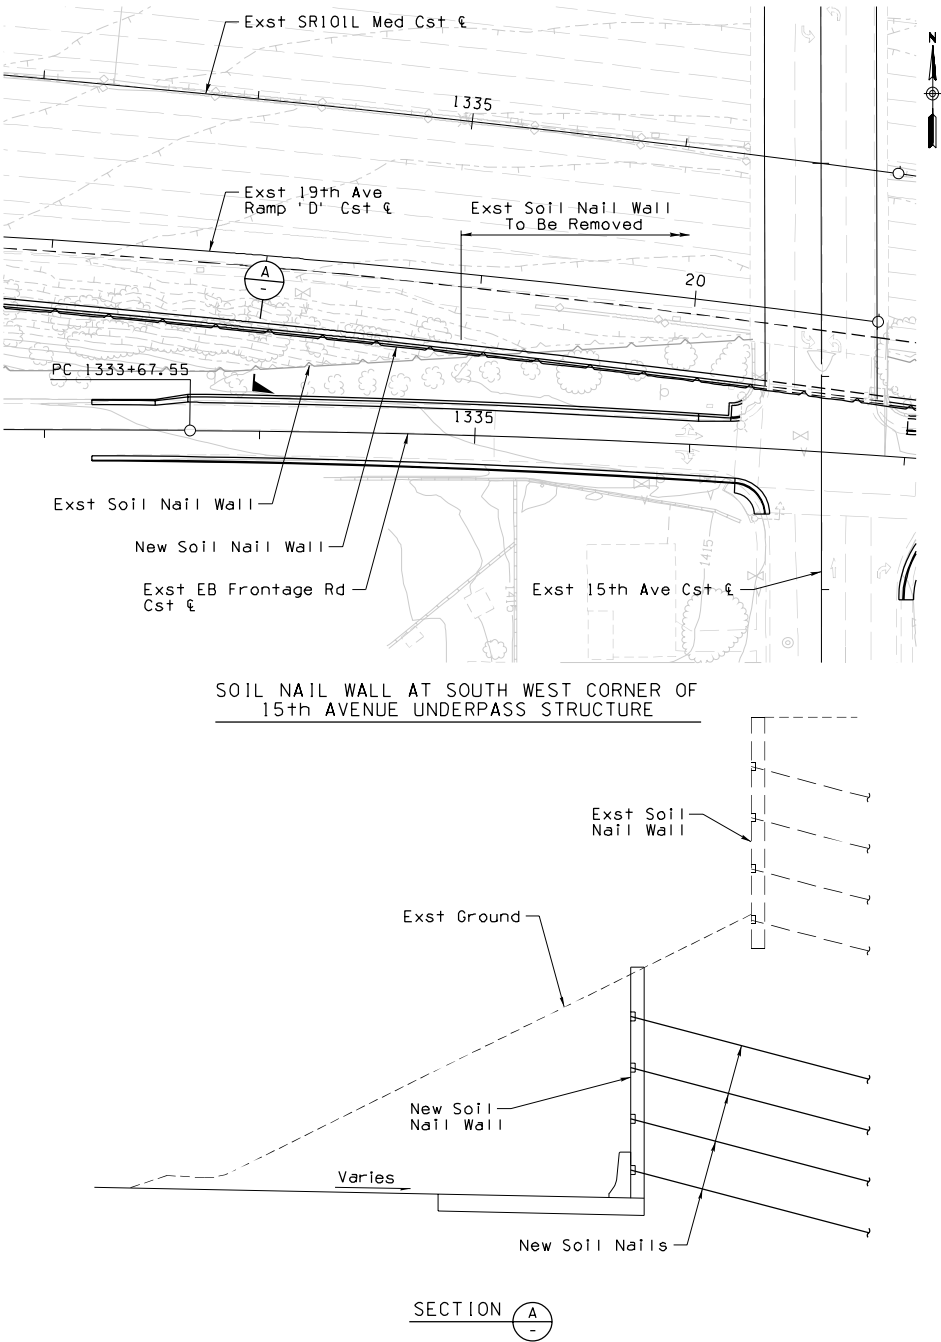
15<sup>th</sup> Avenue Soil Nail Wall Concept
